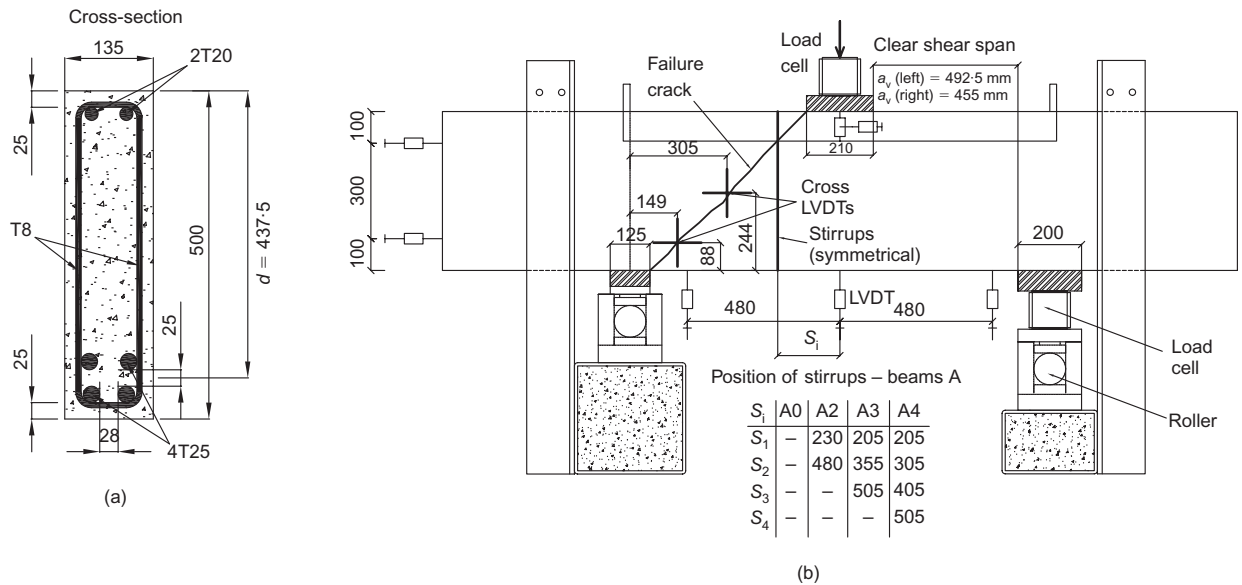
(a) Cross-section of beams A; (b) test arrangement: geometry, position of stirrups, loading plates and instrumentation (LVDTs)
